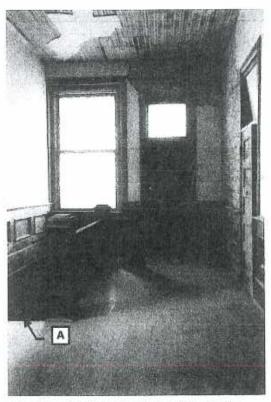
Main Entry Stair Hall view north into north alcove. (A) Entrance to rear stairwell. 55
